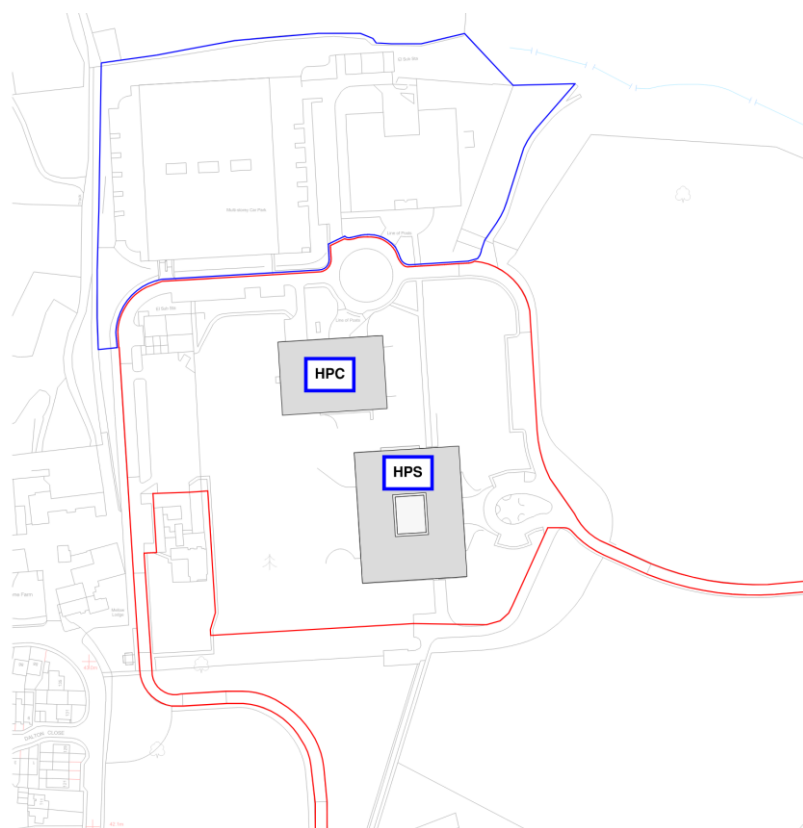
Application site plan, Hayes Park Central (HPC) is the smaller building to the north of the plan, Hayes Park South (HPS) is the larger building to the south.
